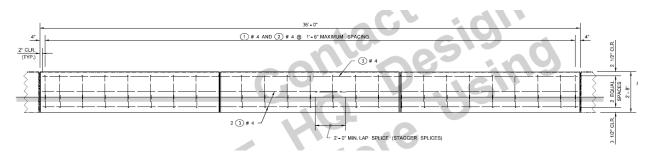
WSDOT Low-Profile Barrier Elevation View.
